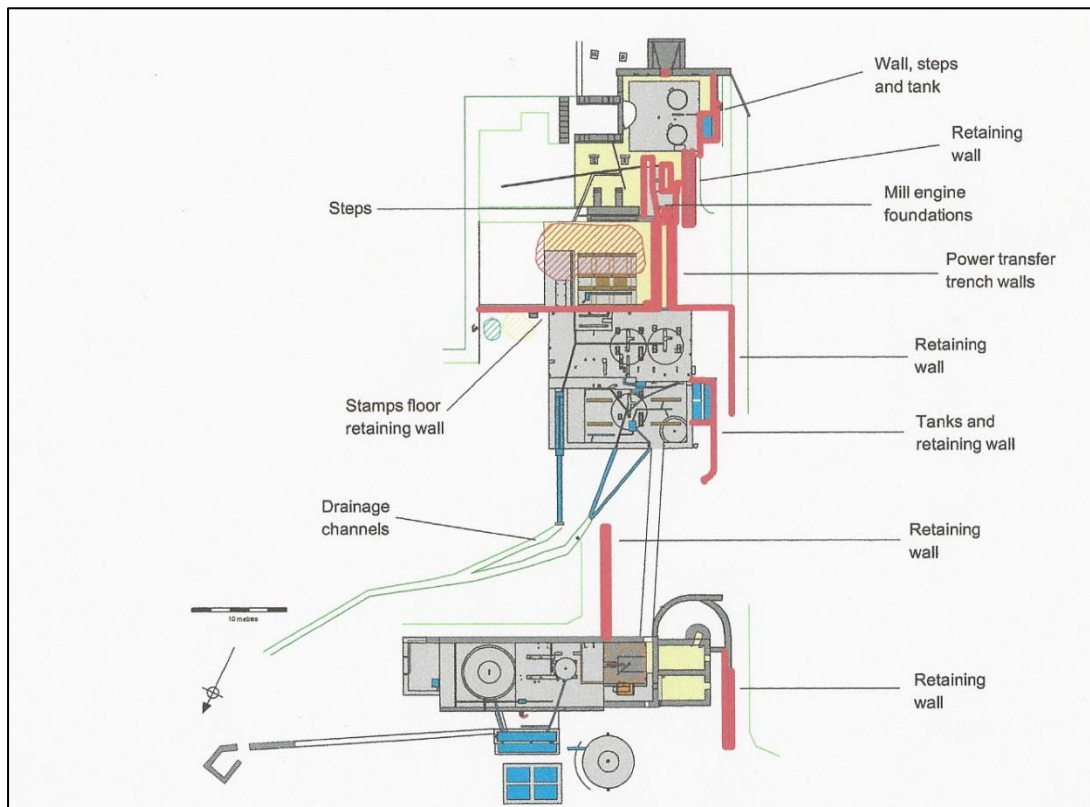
Outstanding conservation works at North Boscawell dressing floors (highlighted in red).
